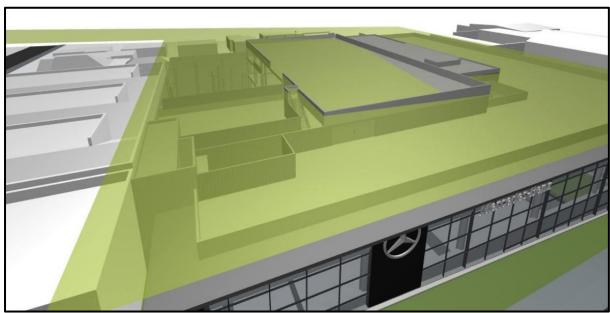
Height plane diagram indicating the portion of the building rooftop (grey) exceeding the 15m height plane (green plane) (Source: Turner)
